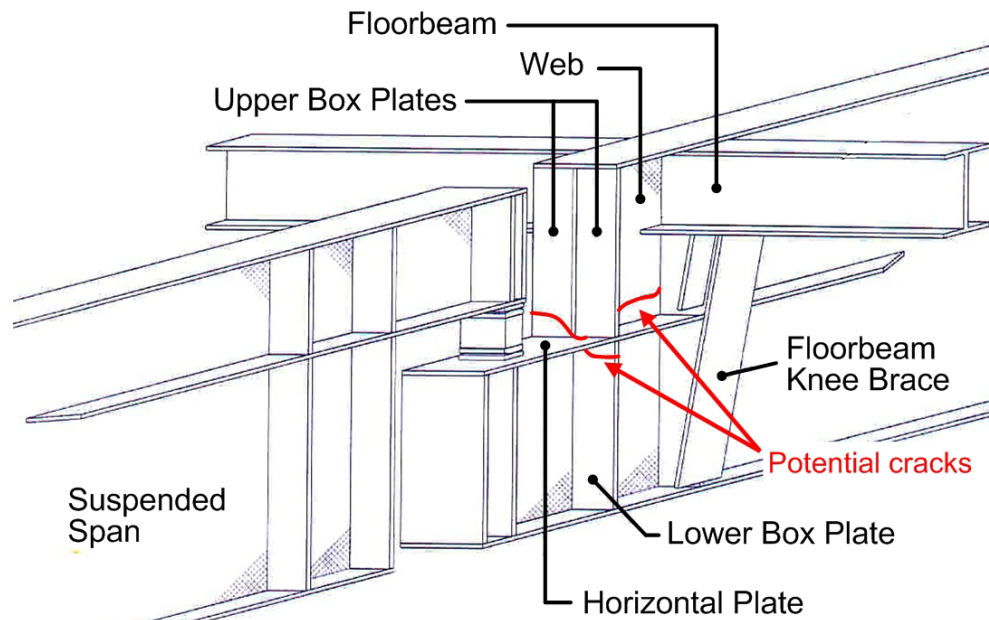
Potential Crack Formation for Cantilever Suspended Span
